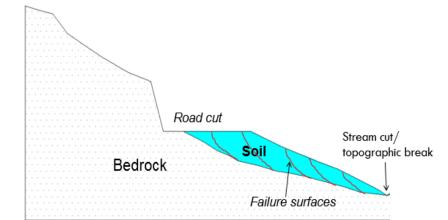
Model 2- road failures due to instability of slope presentation diagram and images
